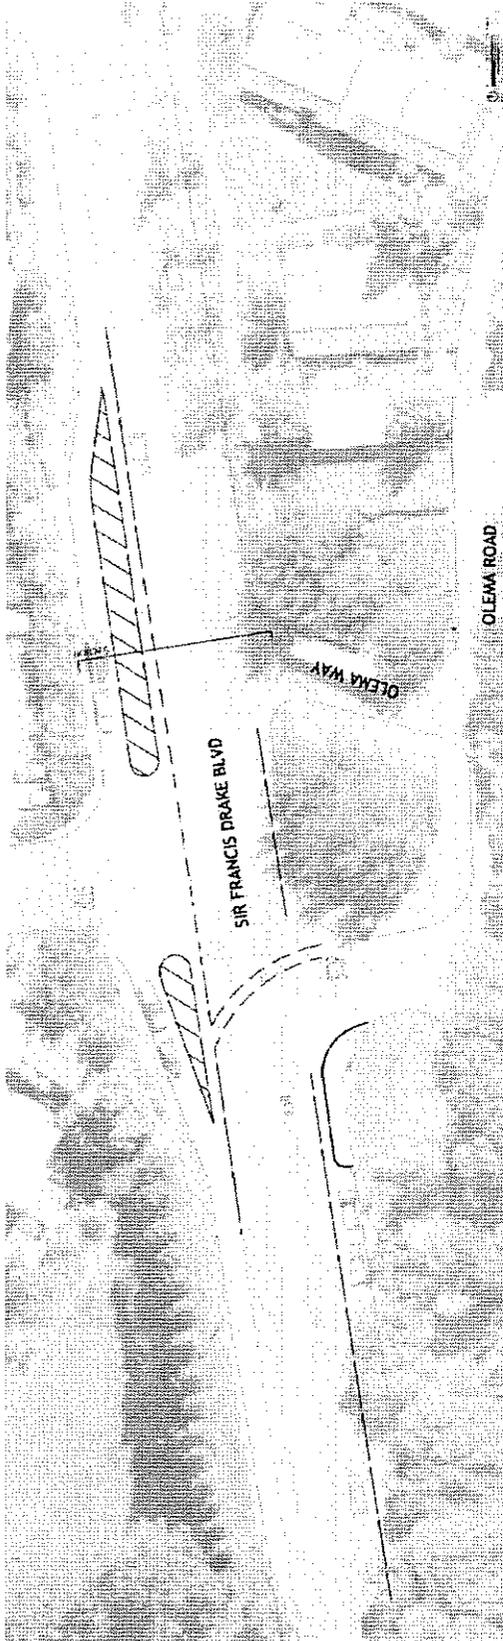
Plan View of Proposed Improvements for Project 1: SFD at Olema Road (west)
